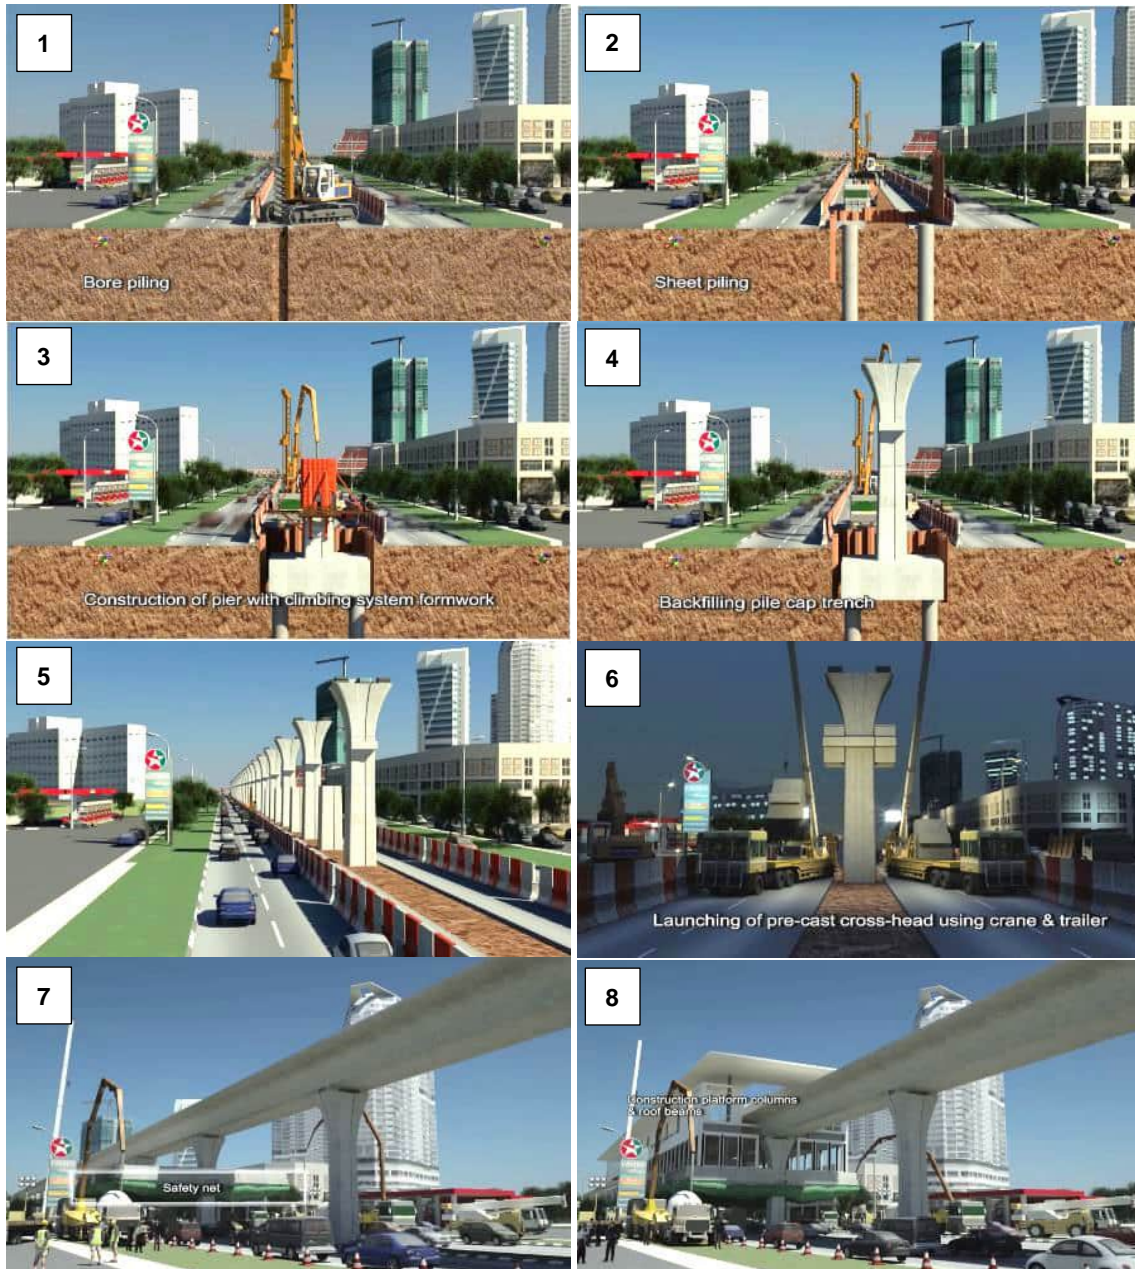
Example of elevated viaduct construction associated with station box [W-33]
